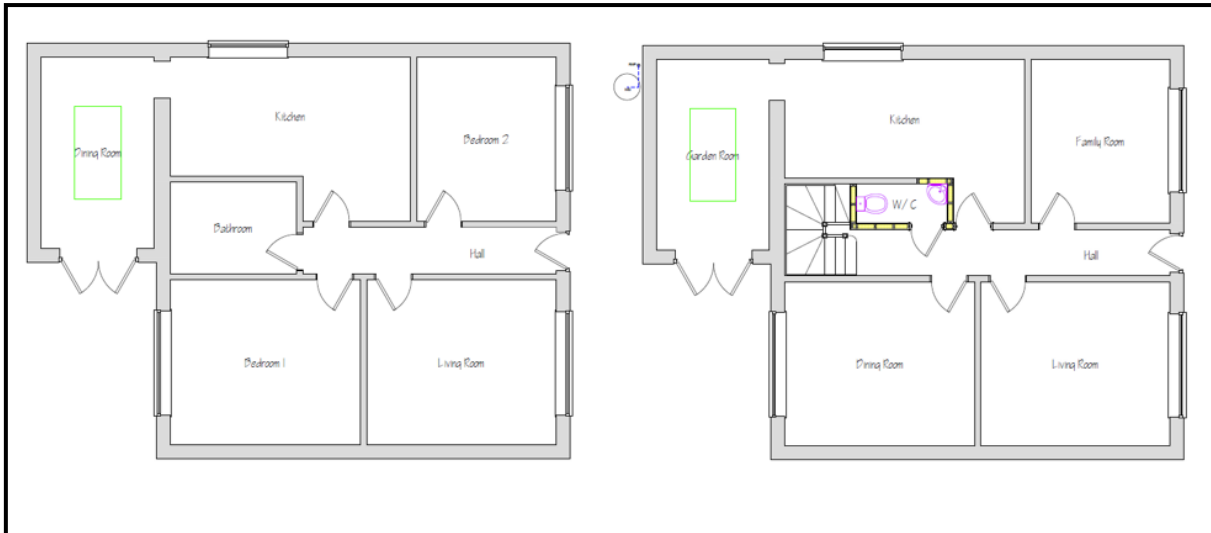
Existing (left) and Proposed (right) Ground Floor Plans
